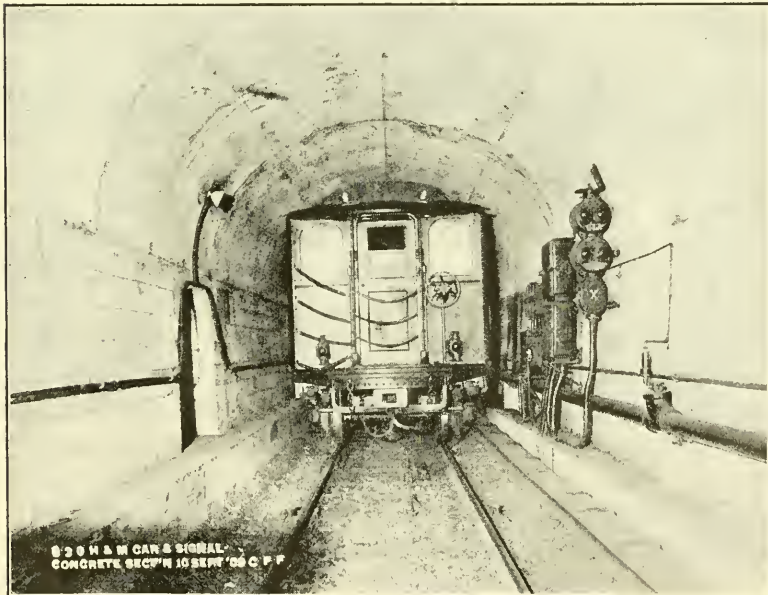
CAR IN CONCRETE-LINED TUNNEL.
